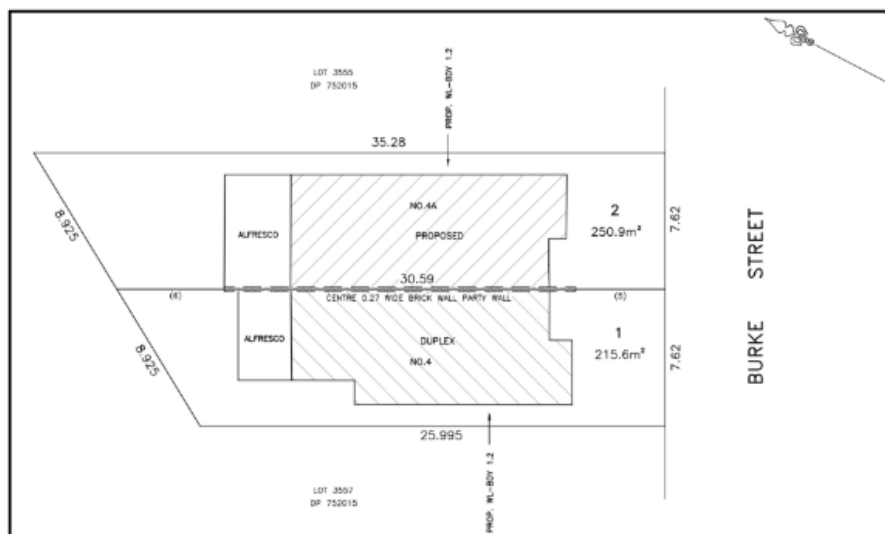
Excerpt of the proposed Torrens title subdivision plan of Lots 1 and 2
